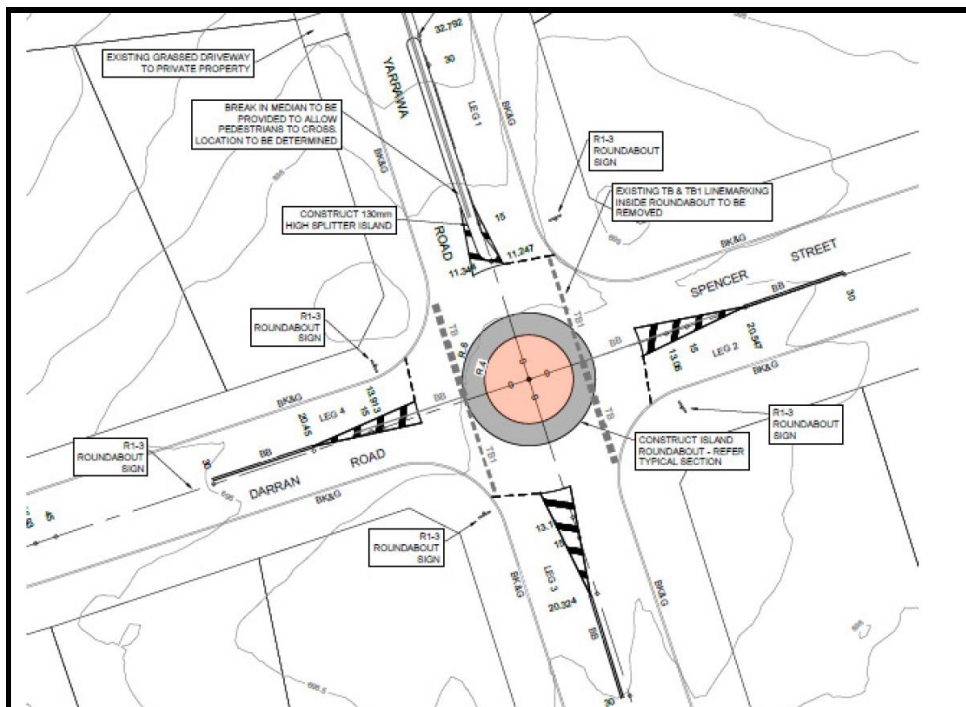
Proposed Interim roundabout at intersection (Source: JMD Report, August 2021)
